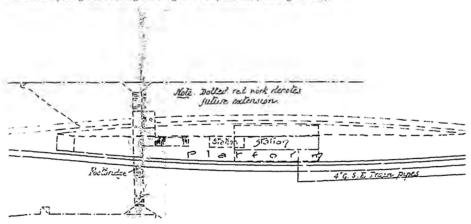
Detail of Figure 3-3 above, showing modification of 1899 platform for duplication, c. 1906 (Sydney Trains Virtual Plan Room)
